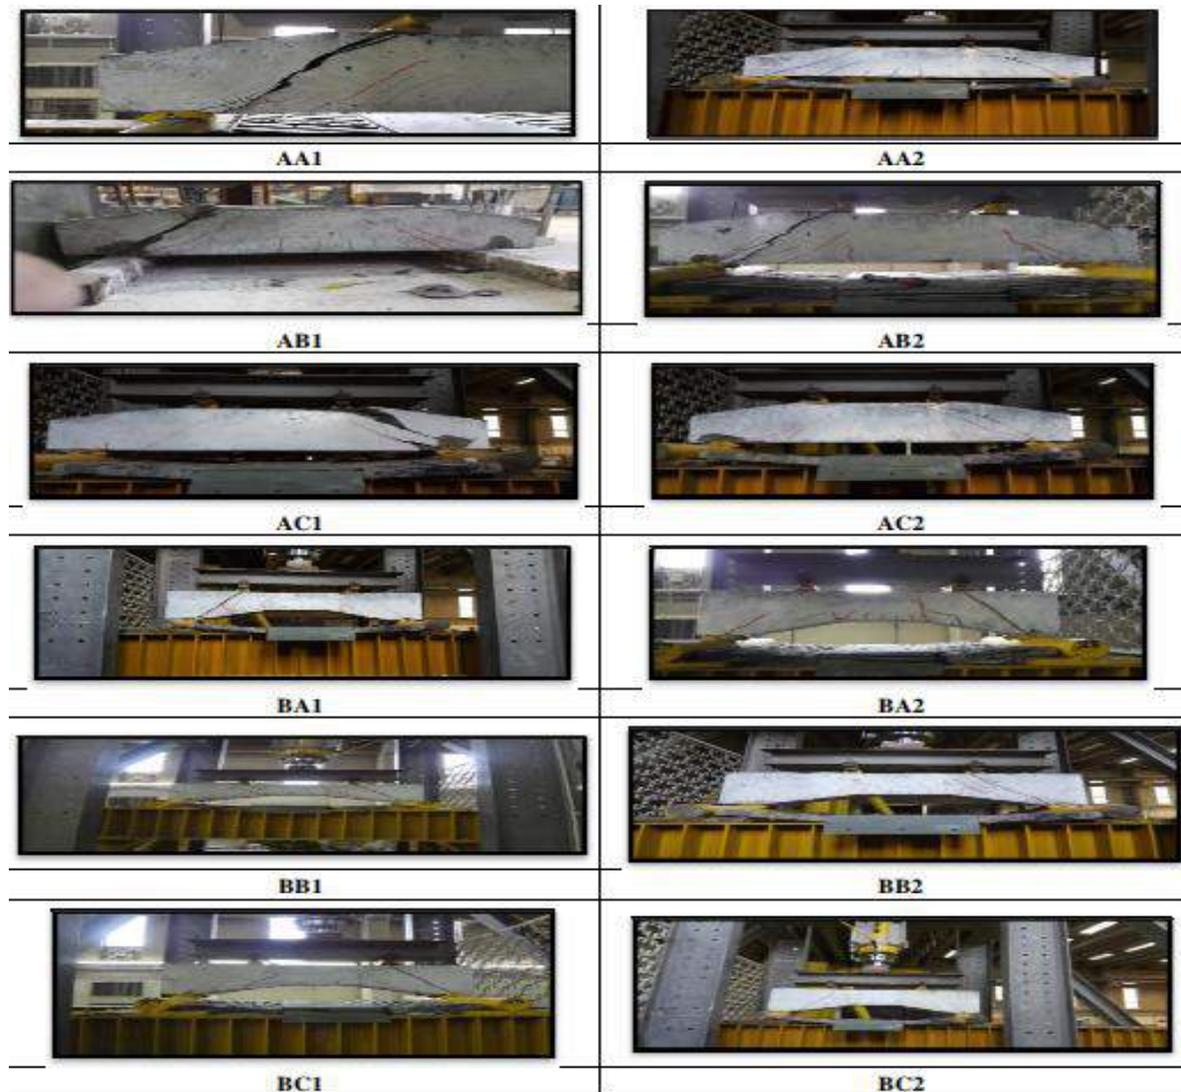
Dhaiban’s specimens pattern failure [60].
